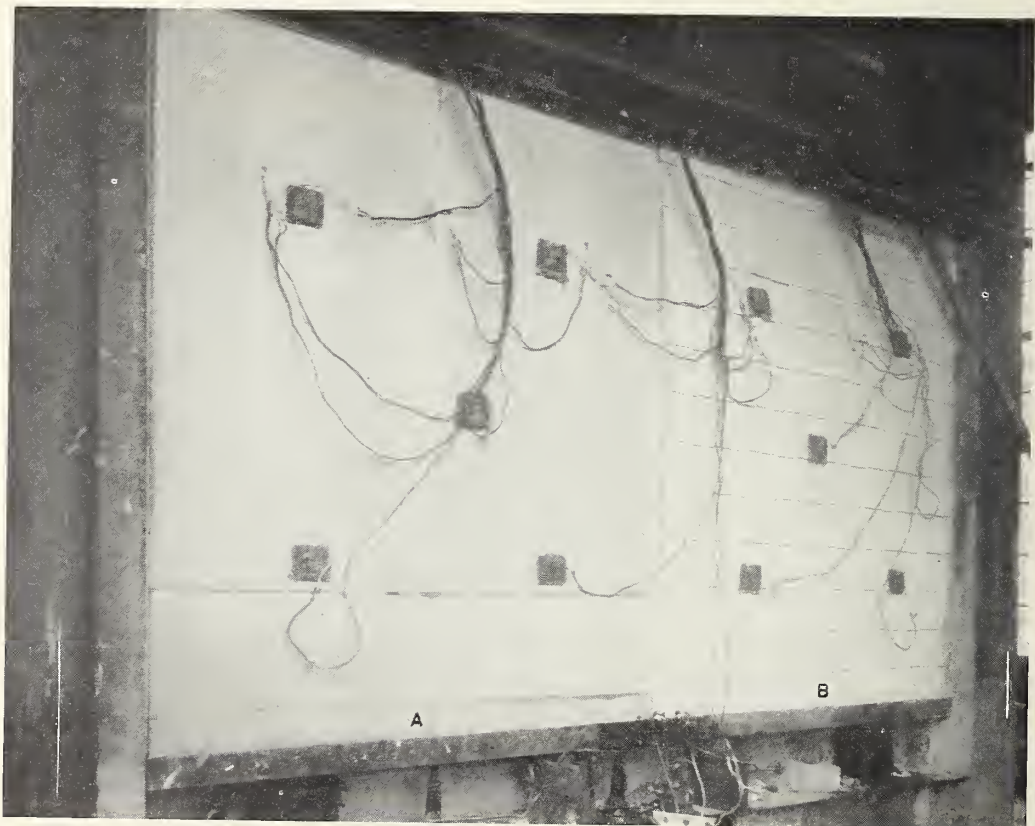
Unexposed face of wall with mineral-wool fill, after 42 min of fire endurance. Test 9.
